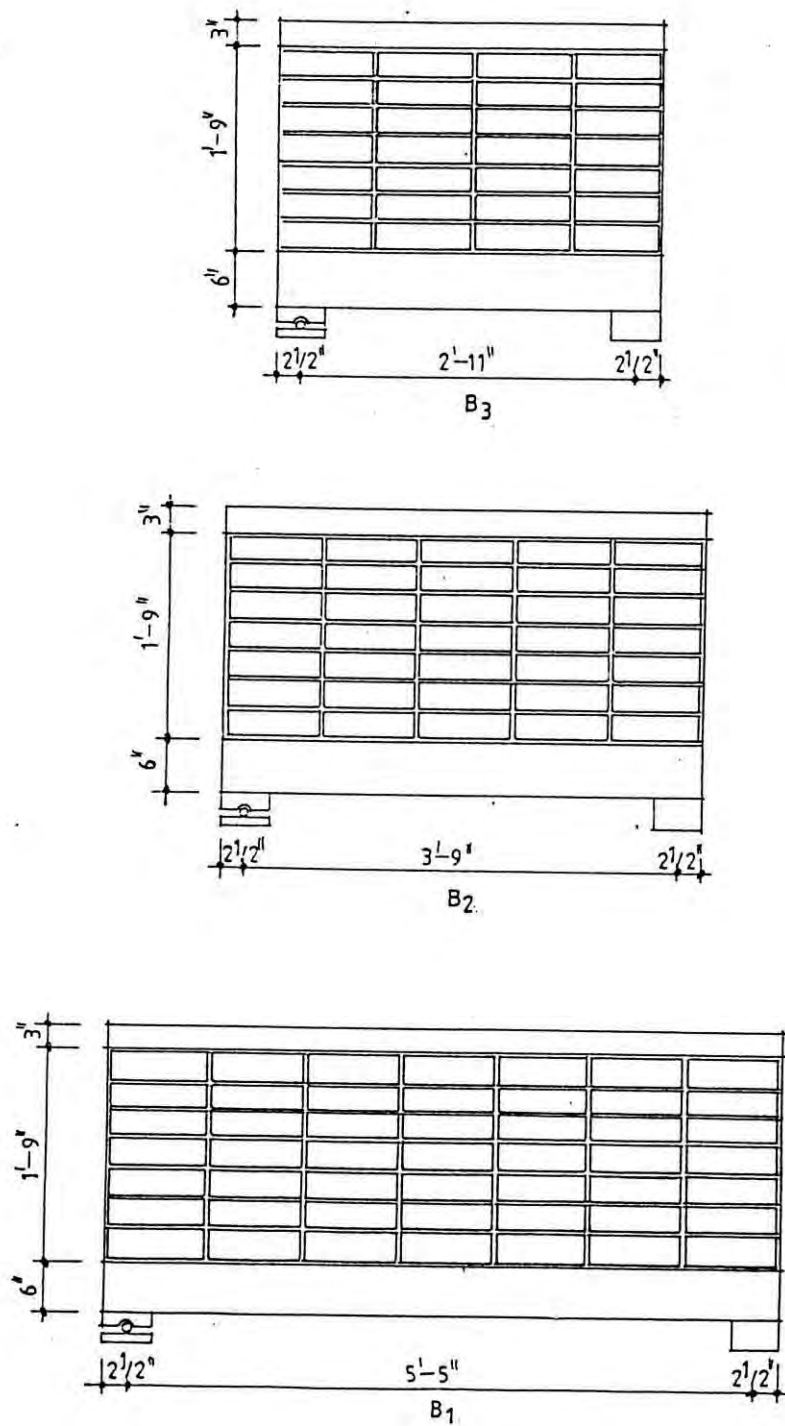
Stack Bonded Composite Wall-Beam Group B
